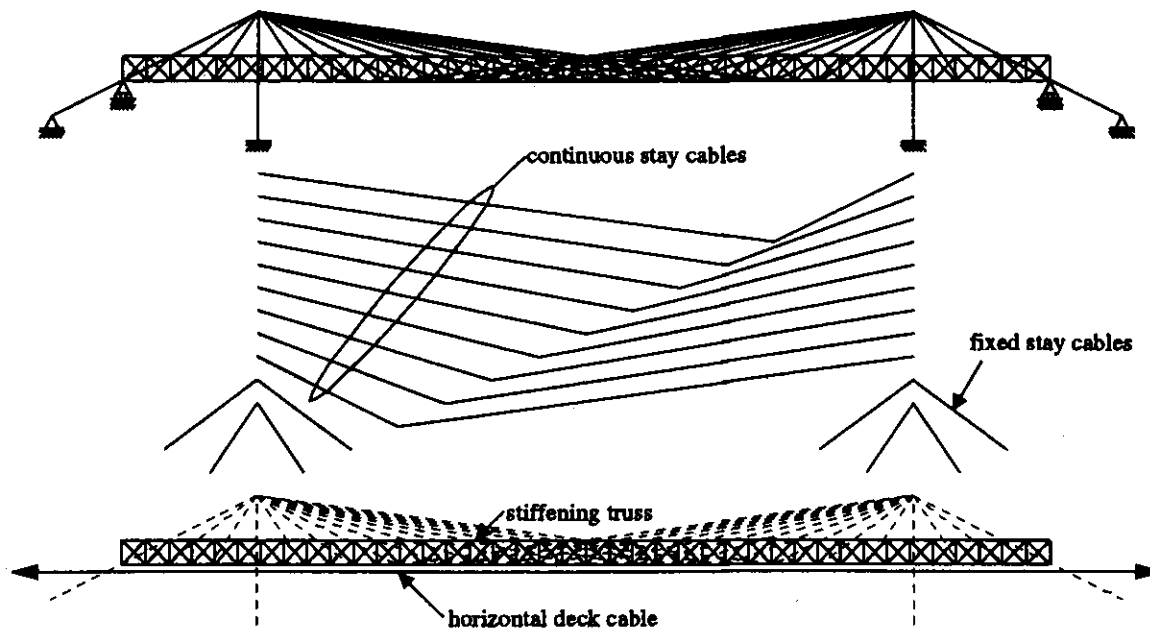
Exploded Elevation of a Bluff Dale-Type Bridge with the Crossing Fan Pattern of Cable Stays
